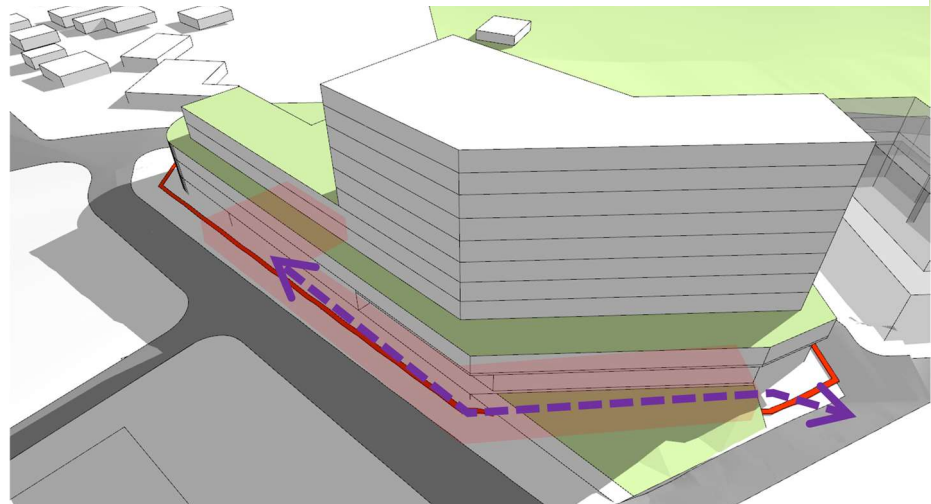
Loading dock is located on the basement level accessed via a driveway from the eastern private road
